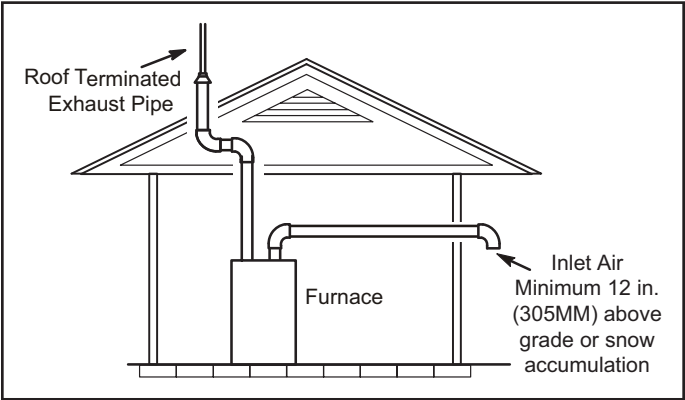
Exiting Exhaust and Intake Vent (no common pressure zone)
